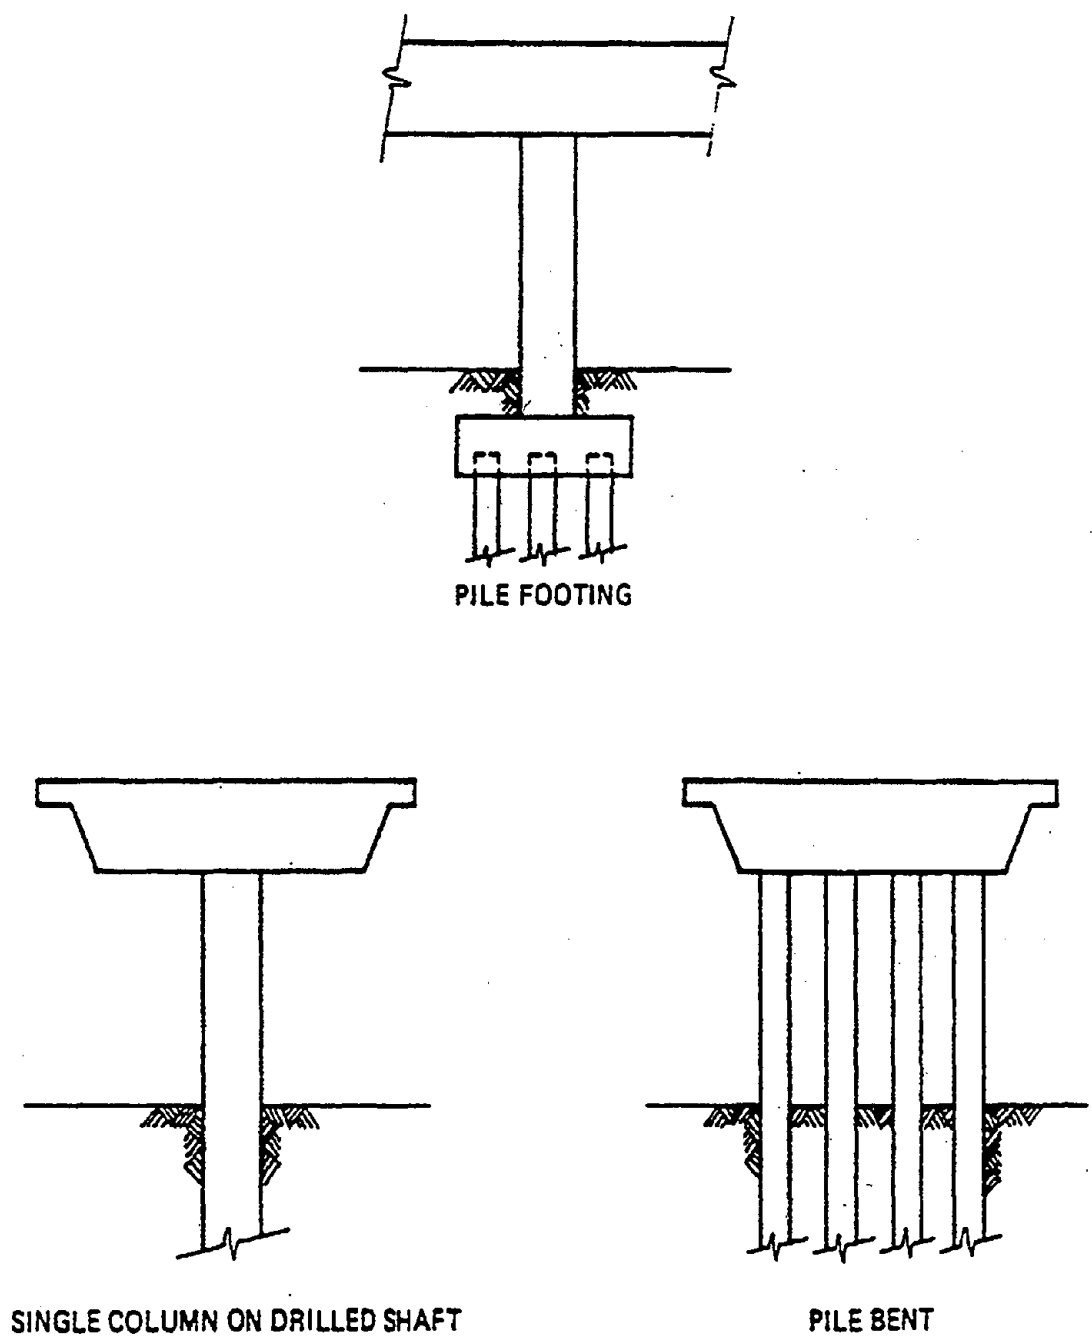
Commonly Used Deep Foundations for Highway Bridges. (Lam and Martin, 1986)
